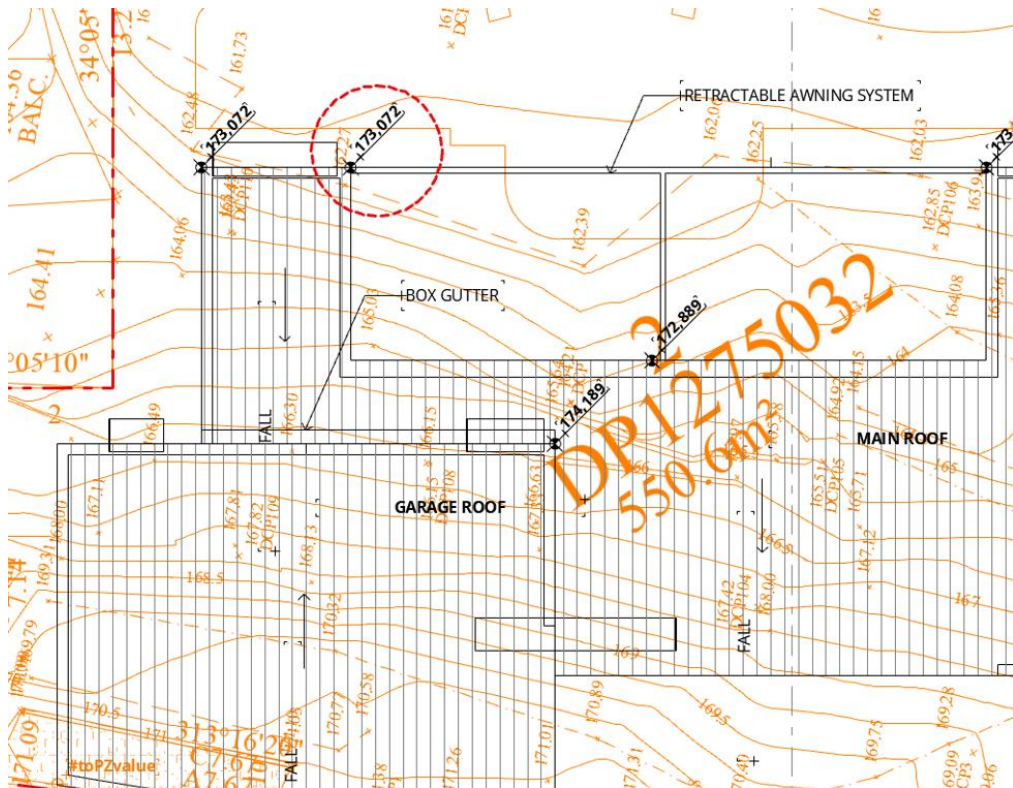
Extract from Site Plan prepared by PNB Architecture noting maximum building height of RL 10.802 to north-eastern elevation of the dwelling (Roof RL 173.072 above existing ground RL 162.27)
